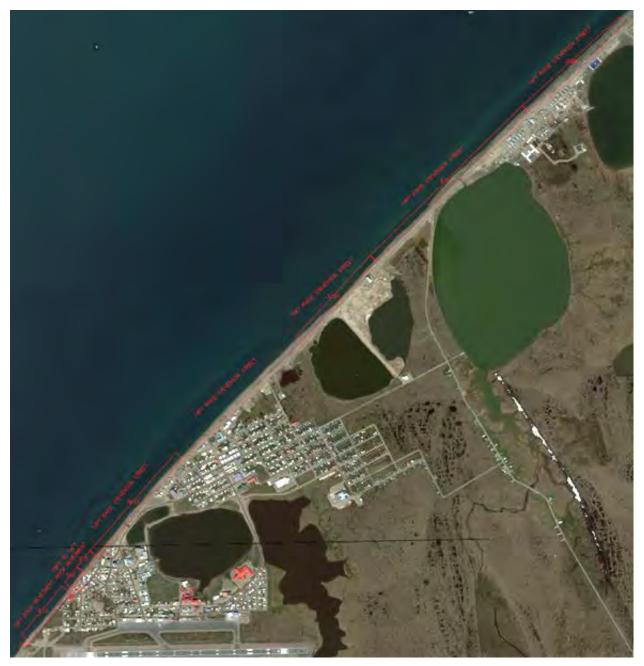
Alternative 2b: Rock Revetment at Bluff and Raise Stevenson Street.
